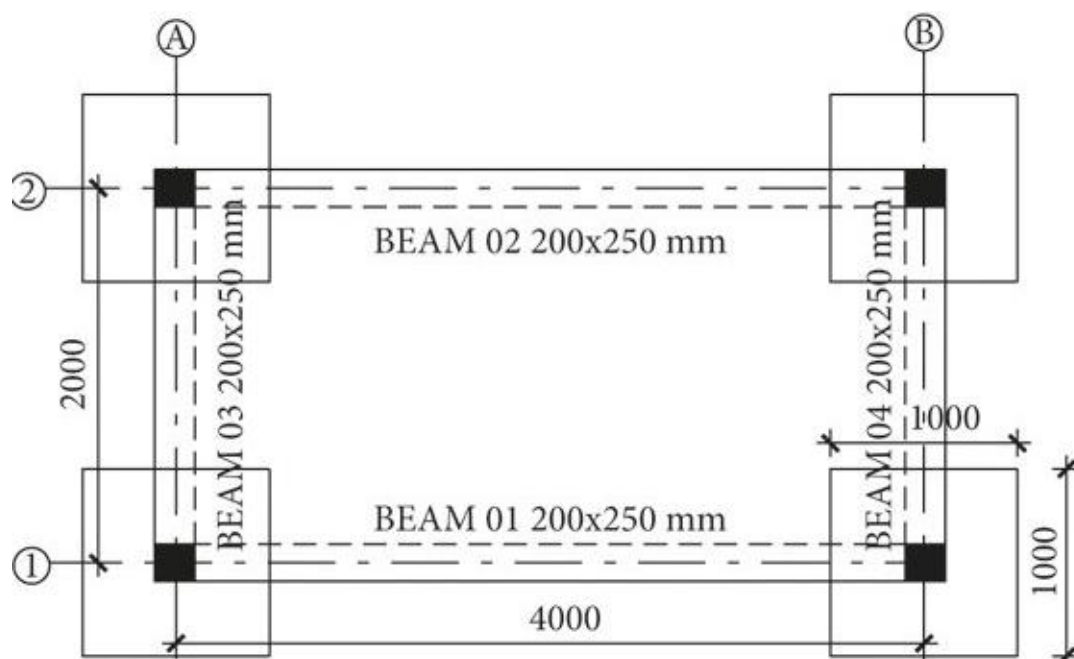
Simple foundation, columns, and ground floor beam layout (Kigoye & Kyakula, 2022).
